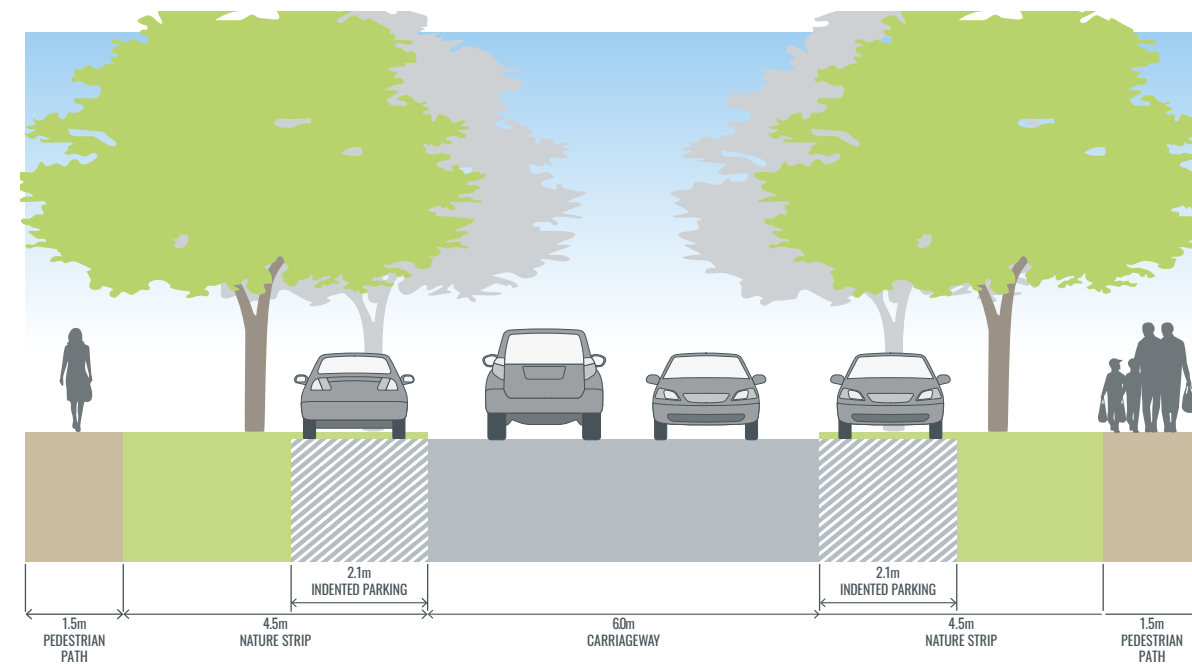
LOCAL ACCESS STREET - LEVEL 1 - WITH INDENTED PARKING (18.0M)
